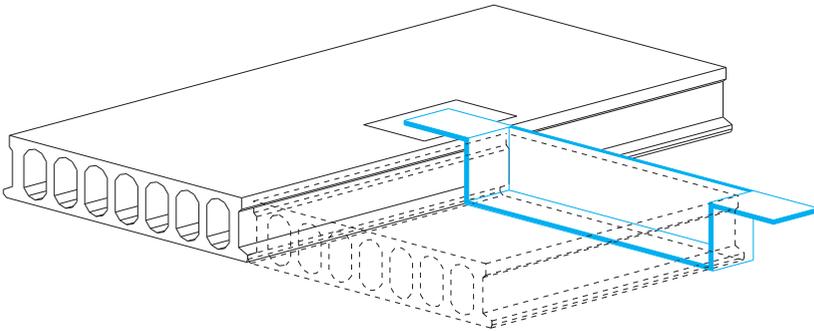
Example of a small steel beam having a span of 120 - 240 cm to support hollow core slabs in the presence of large openings.
